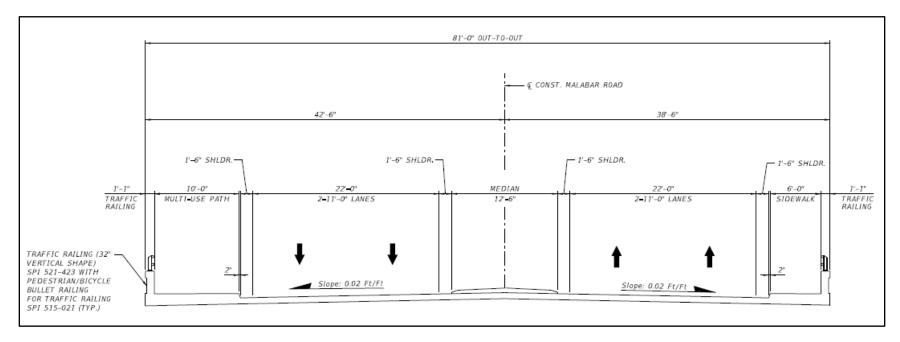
Canal C-10 Bridge – Alternative A Minimum Right-of-Way and Raised Sidewalk
